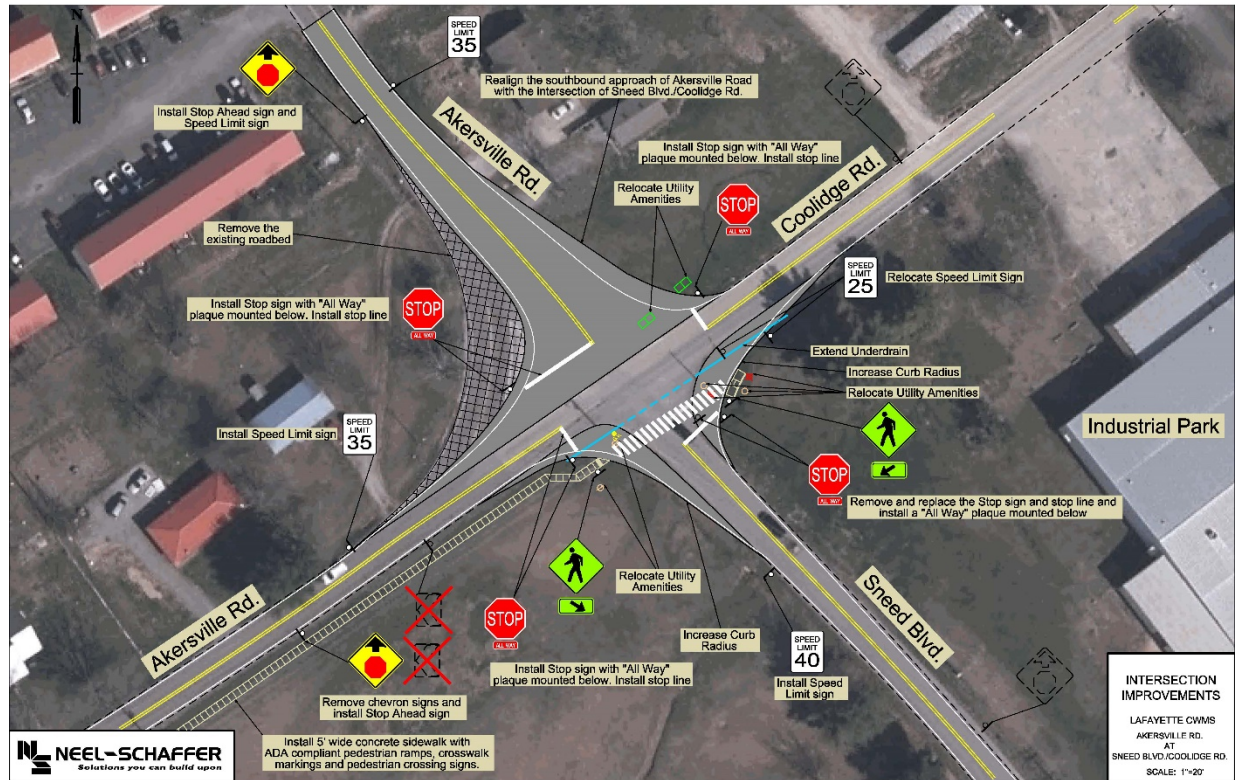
Akersville Road and Sneed Boulevard Proposed Intersection Improvements
